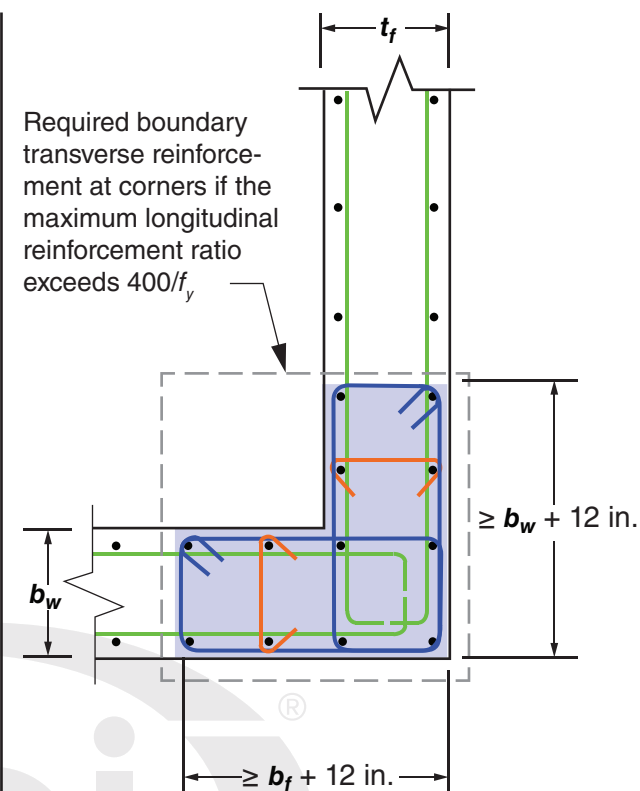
Transverse reinforcement at the intersection of a wall web and flange.
